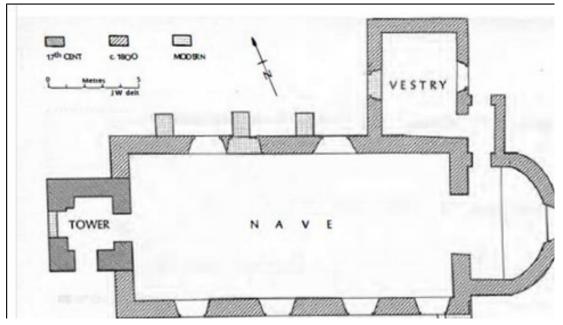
Simplified Ground Floor Plan of Church (Bradley et al, 1986)
